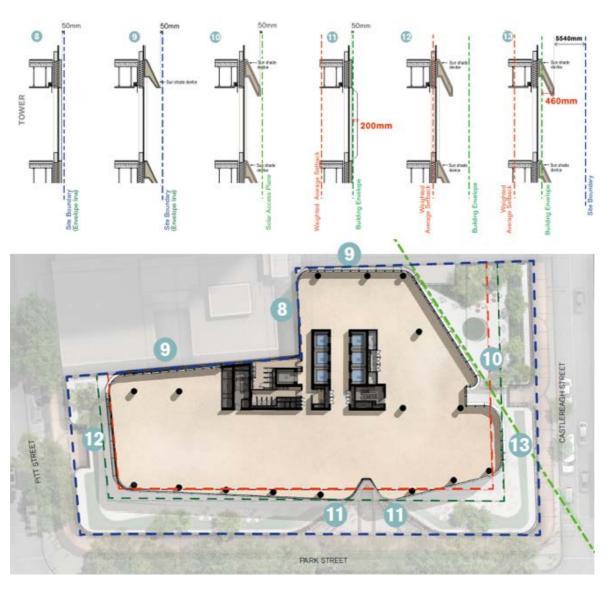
| Tower projections beyond building envelope (Source: RtS)
